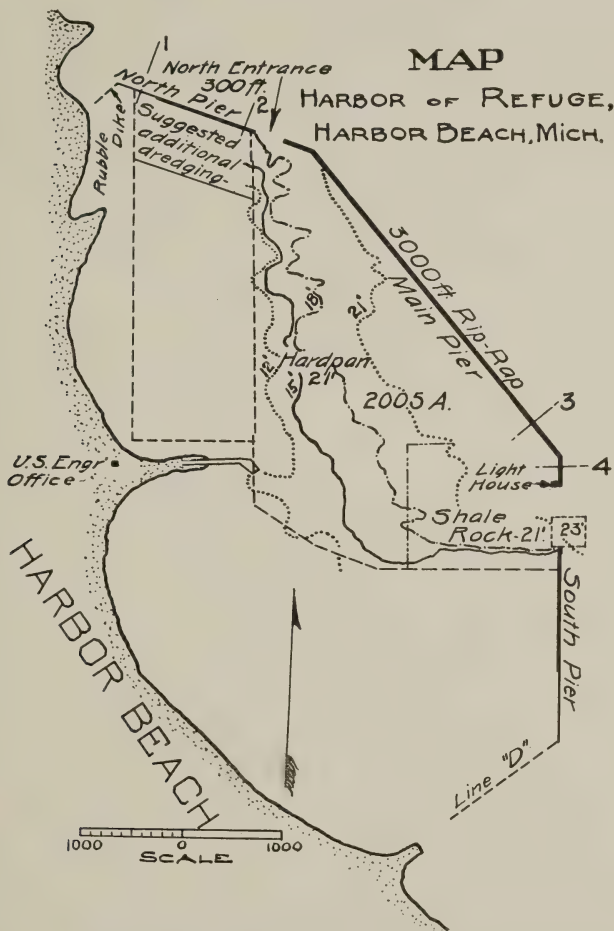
Plan of harbor of refuge at Harbor Beach, Michigan.
